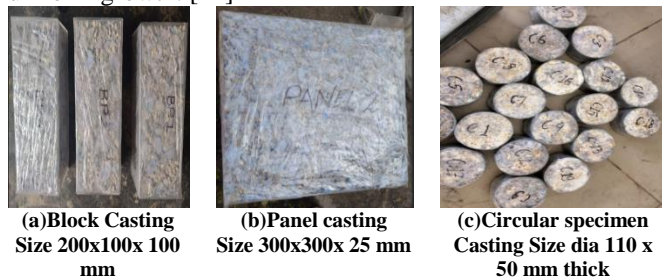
Shows casting mold a. Block, b. Panel and c. Circular specimen
